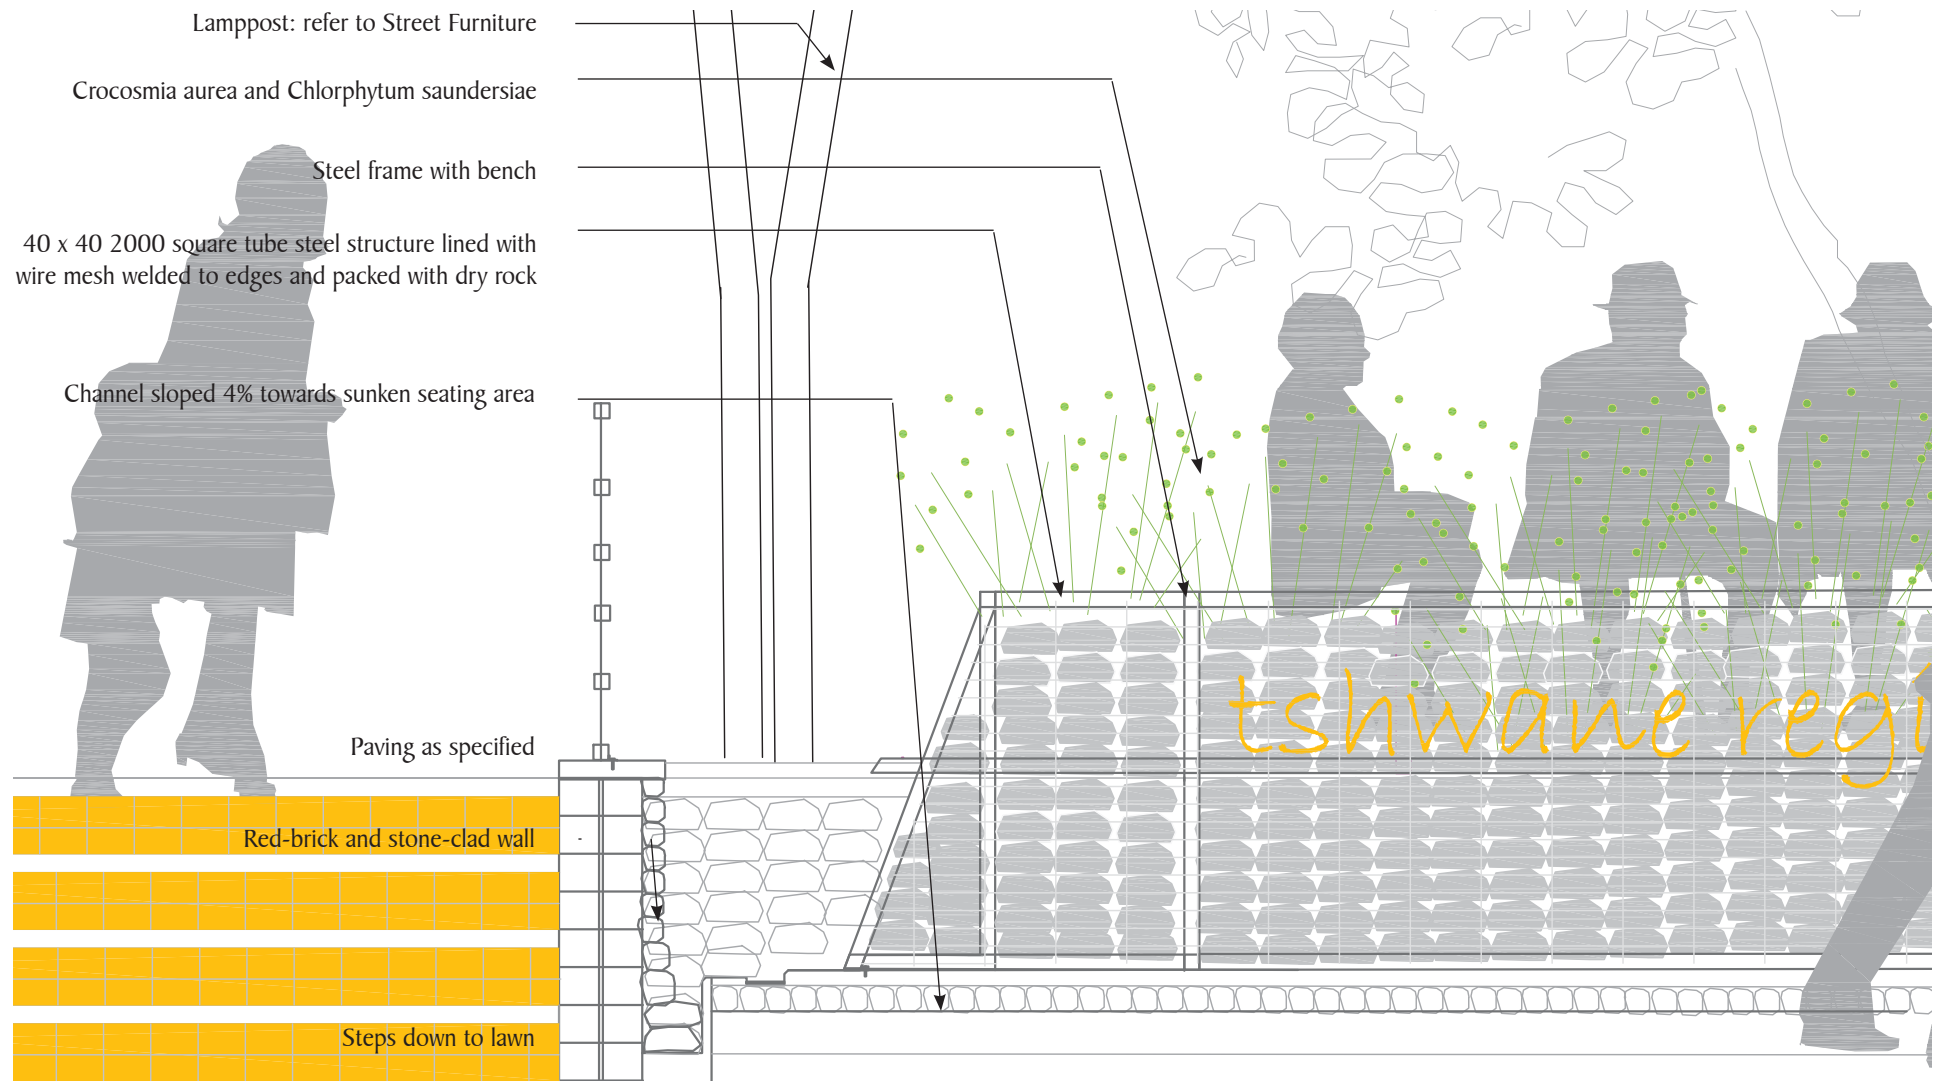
Elevation of feature wall connection to walls, steps and ramps. (Author, 2008) Scale 1: 20
